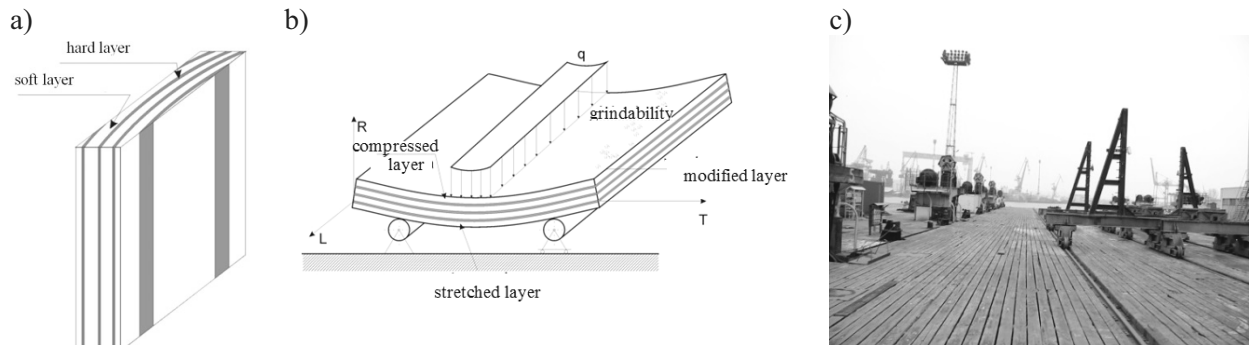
Structural elements: a) the board, b) load board, c) docking jack
